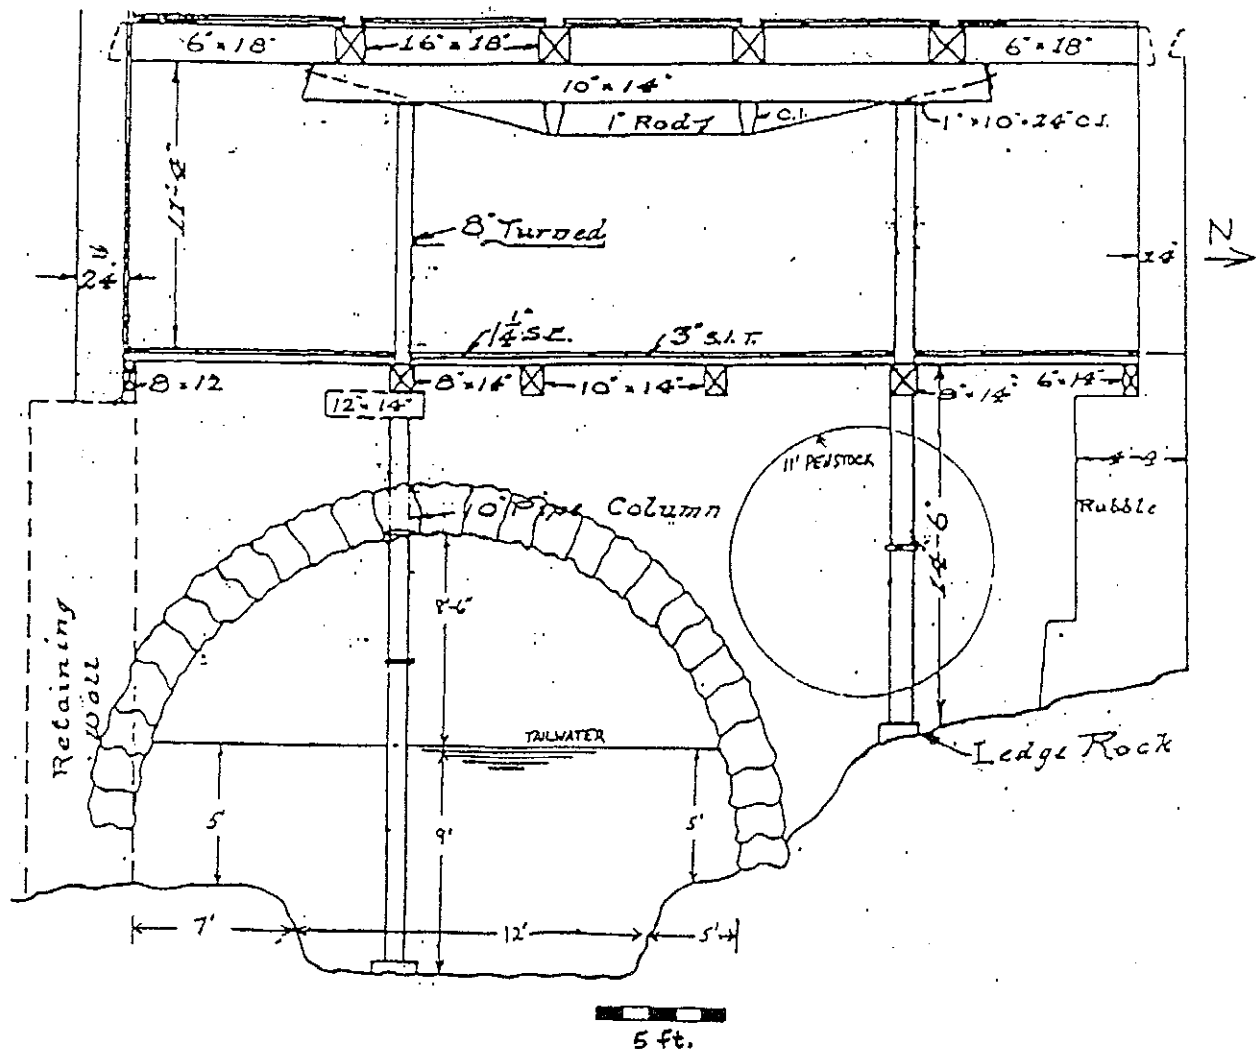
SECTION OF MILL NO. 1 WHEELHOUSE AND FIRST FLOOR
